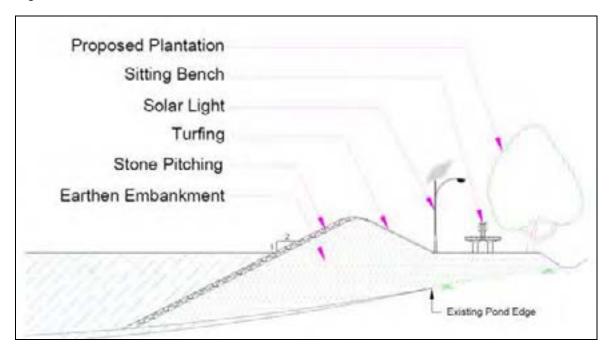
Schematic layout of enhancement measures proposed for Pond
